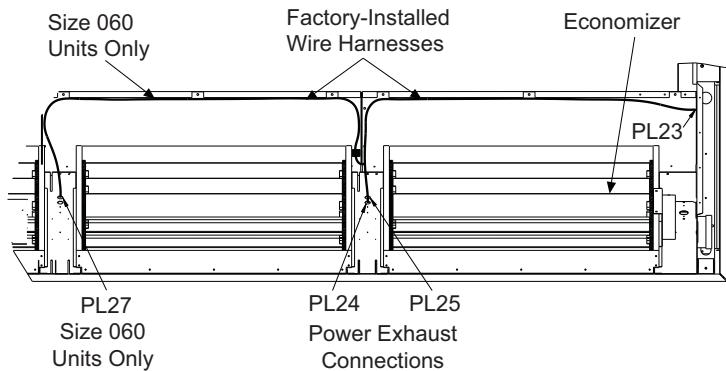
Wire Harness Plug Location for 48/50A Only
